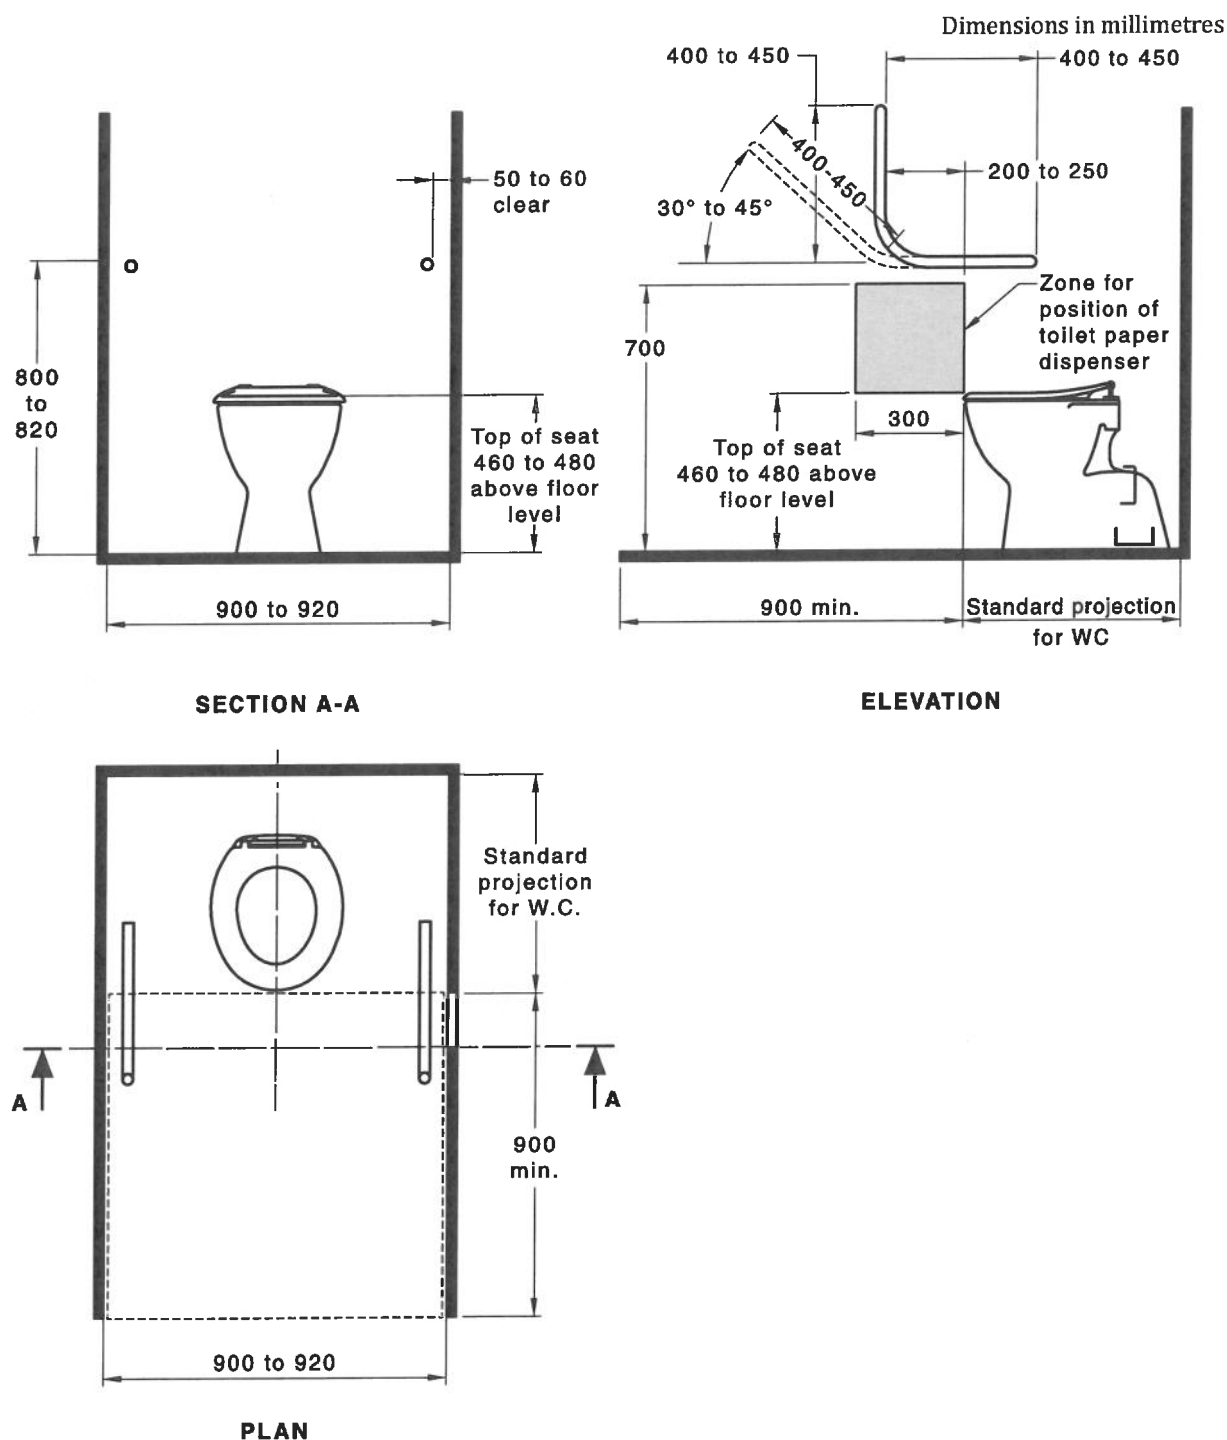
(A) — Sanitary compartment for people with ambulant disabilities — Plan and elevation
